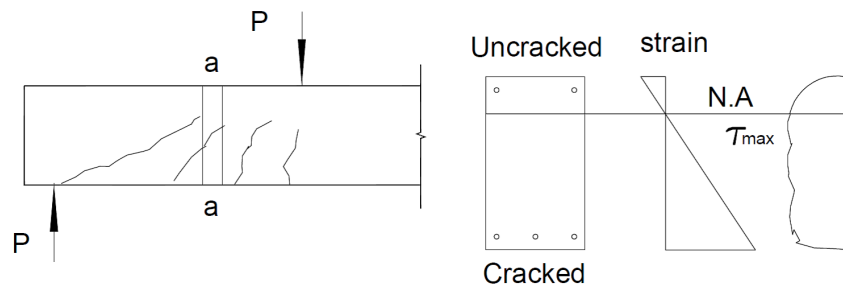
Shear stress distribution of cracked RC concrete beam
